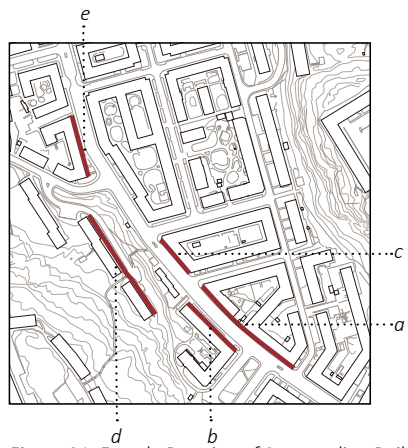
Facade Drawing of Surrounding Buildings 1:500
